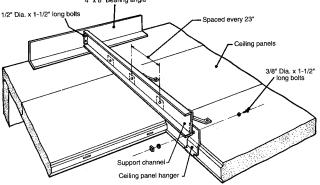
DETAIL SHOWING SUSPENDED CEILING PANELS FROM BUILDING STRUCTURE
